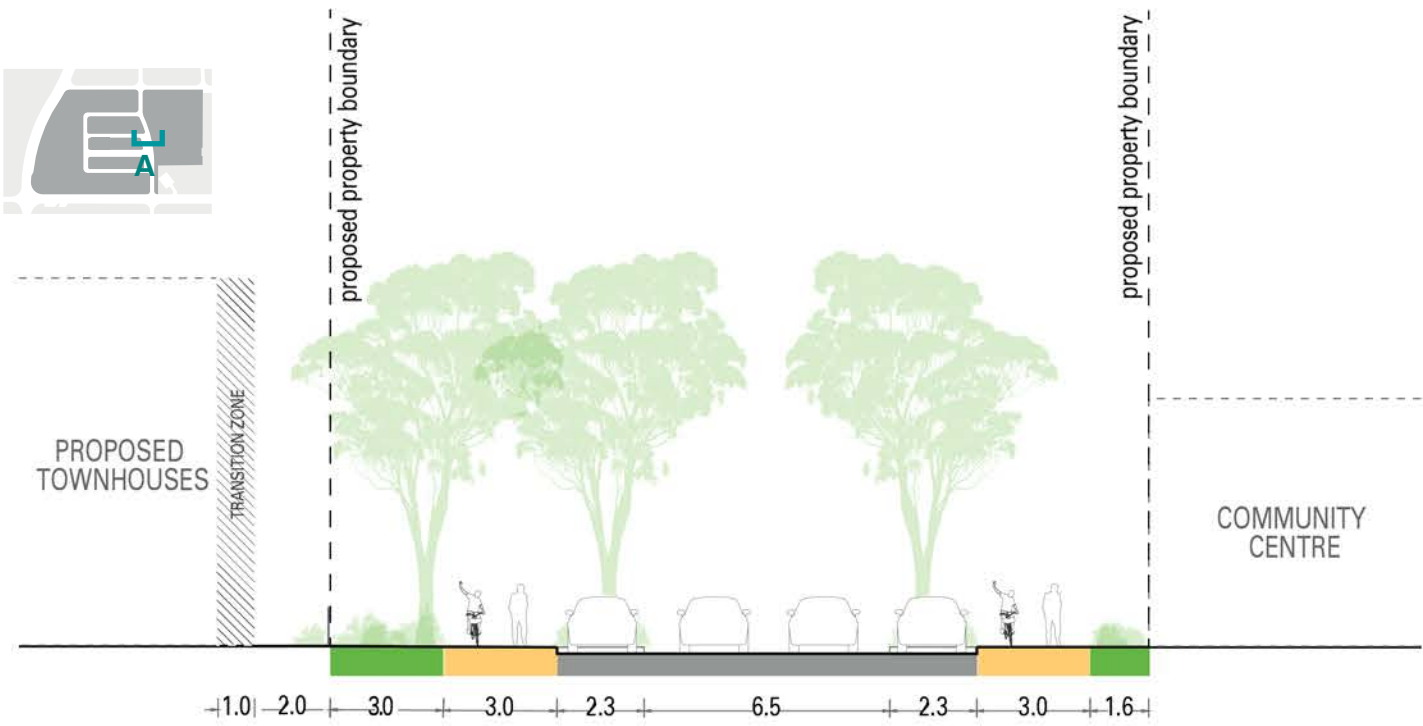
Section A: North-South Boulevard (1:200@A3)
